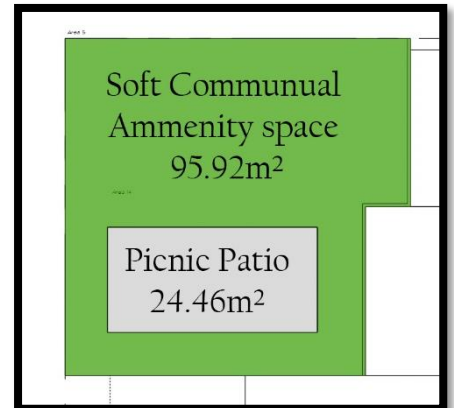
Communal amenity space plan showing hard and soft landscaping
